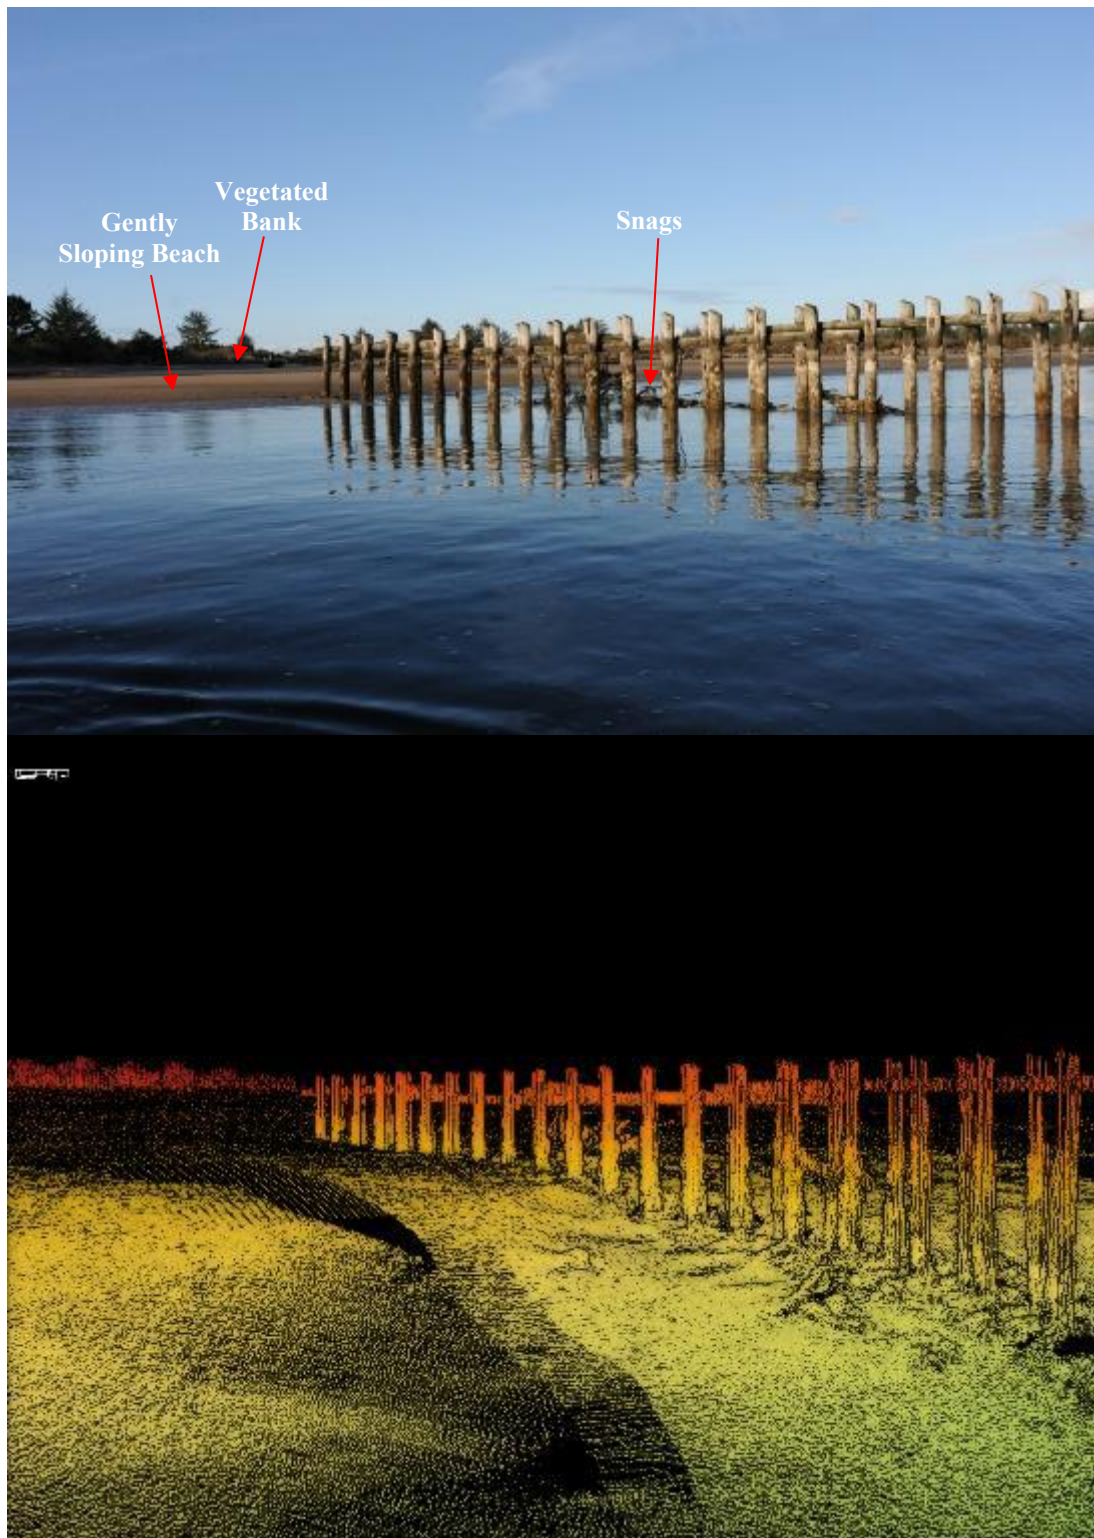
Pile Dike 6.8 viewed from downstream looking shoreward.
